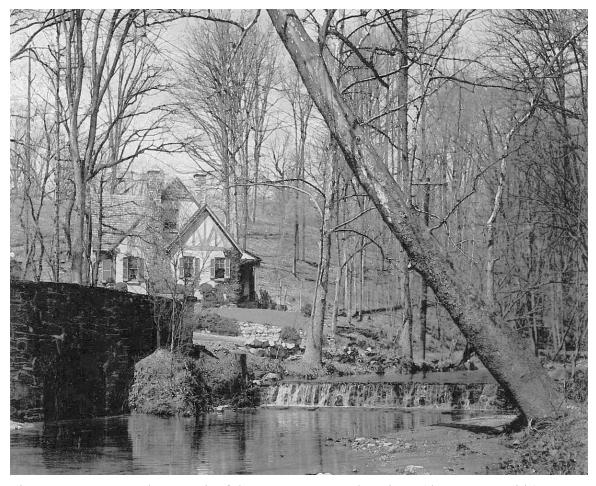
Pre-1934 Photograph of the Soapstone Creek Culvert (downstream side) without the wing walls. (E. B. Thompson, DC Public Library Photo Archives).
